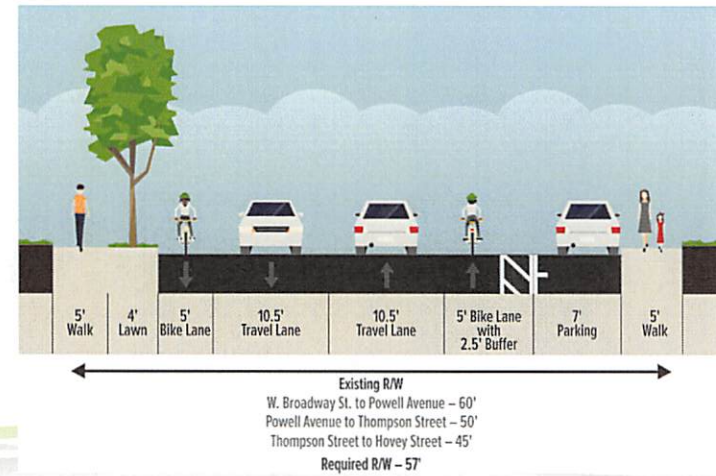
W BROADWAY STREET TO HOVEY STREET
